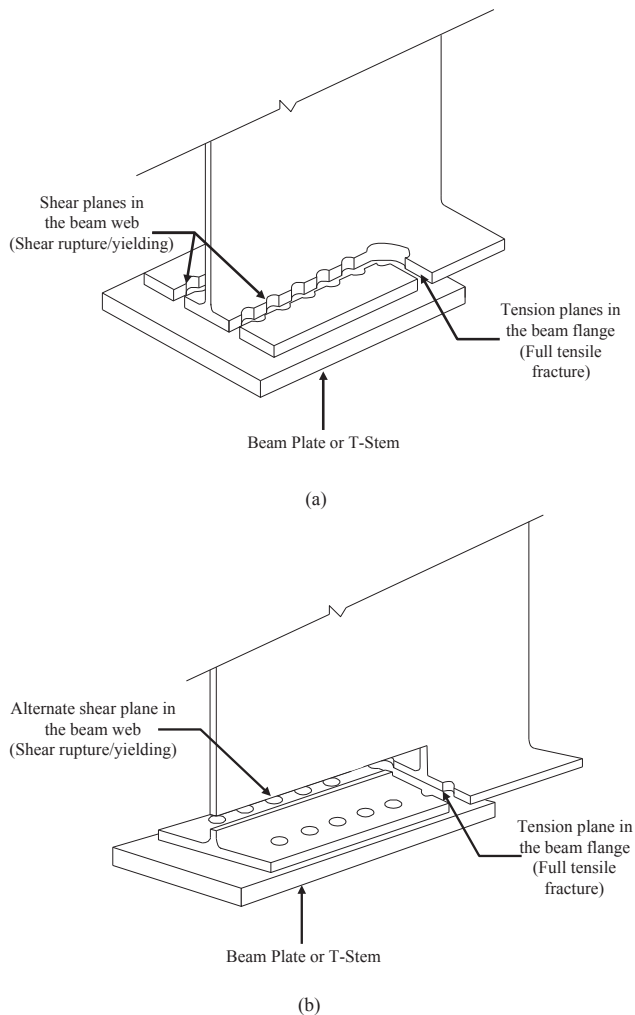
(a) Typical block shear failure path and (b) alternate block shear failure path in W beam section connected to thick plate.
